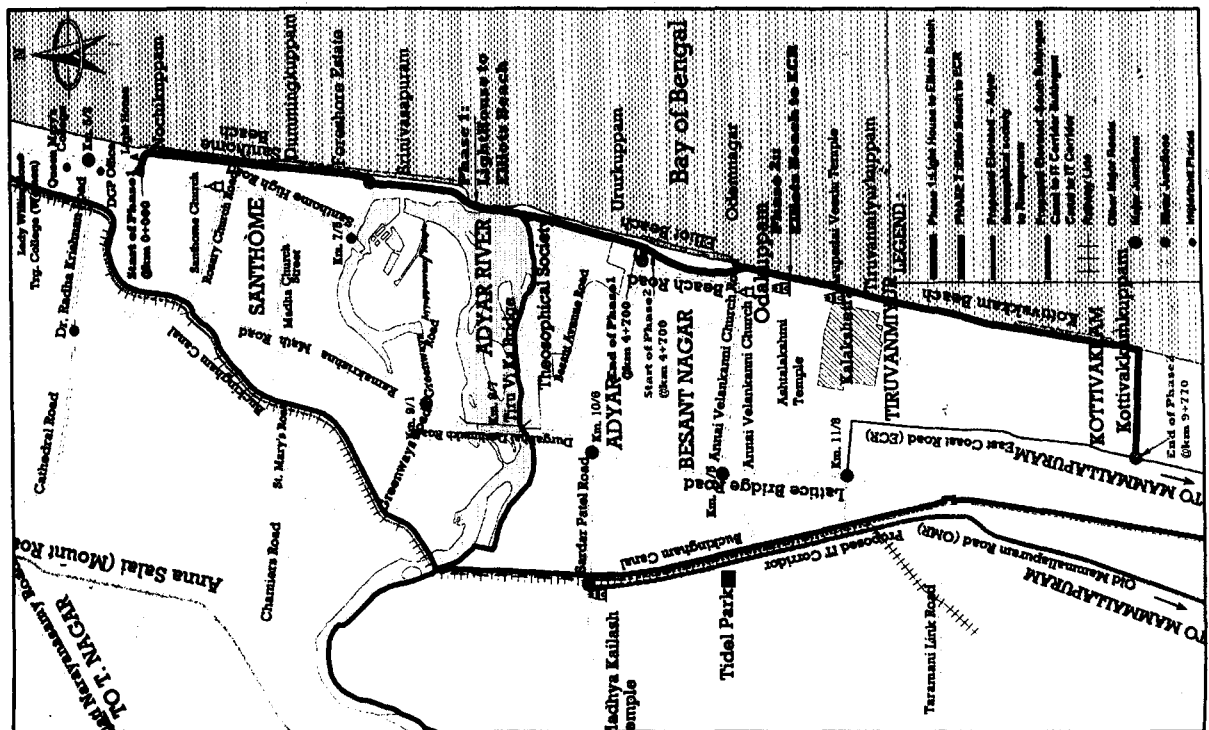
Phasing for Elevated Road between Light House and ECR
